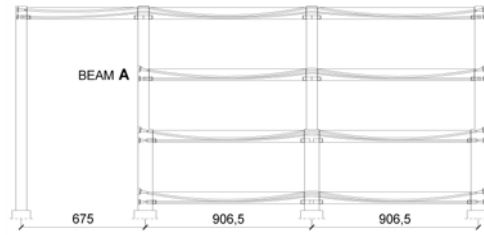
Tendons profile in the longitudinal building direction and beam elements
